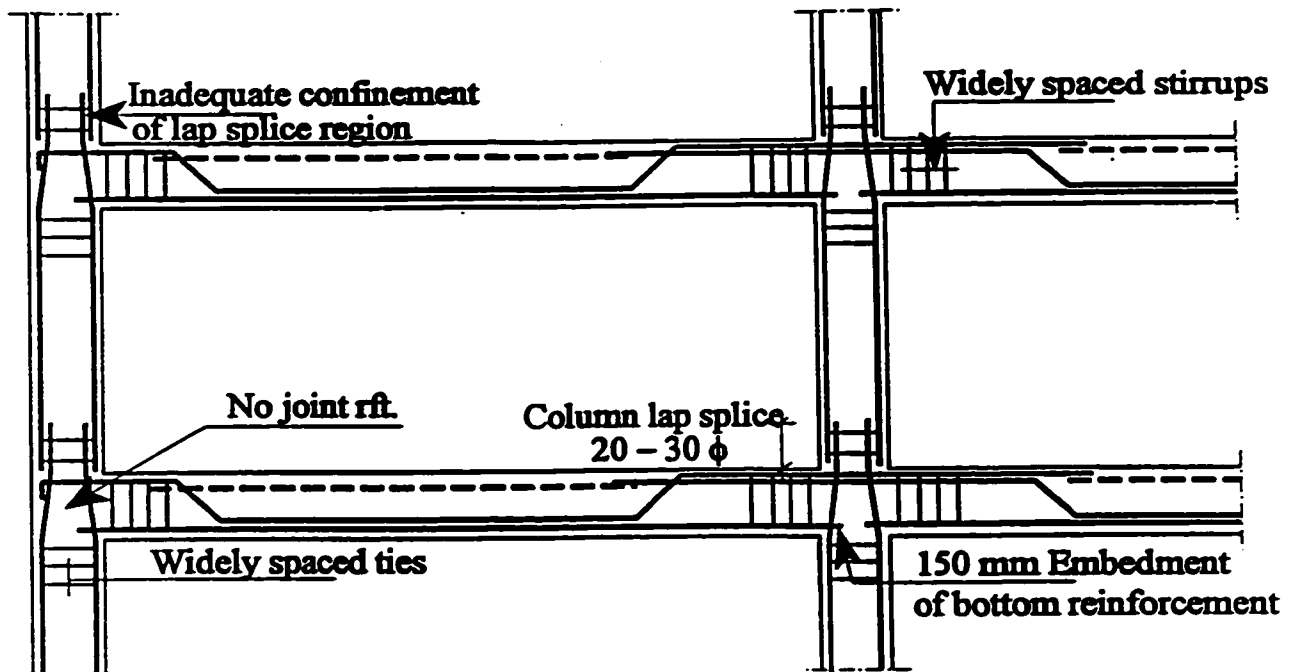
Nonductile reinforcement details in gravity load designed buildings
